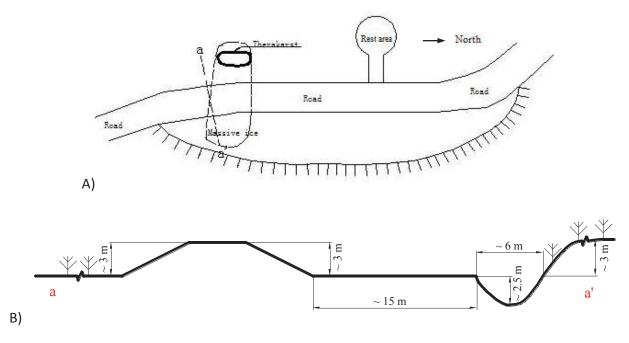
Schematic illustration of the Dry Creek adaptation site for A) Localisation of proposed embankment cross section in transverse profile; and B) a-a' embankment cross section, km 1840.6
